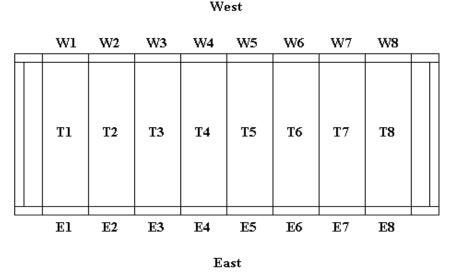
Plan of the test house in Trondheim, showing the location of the wall and roof test elements.
